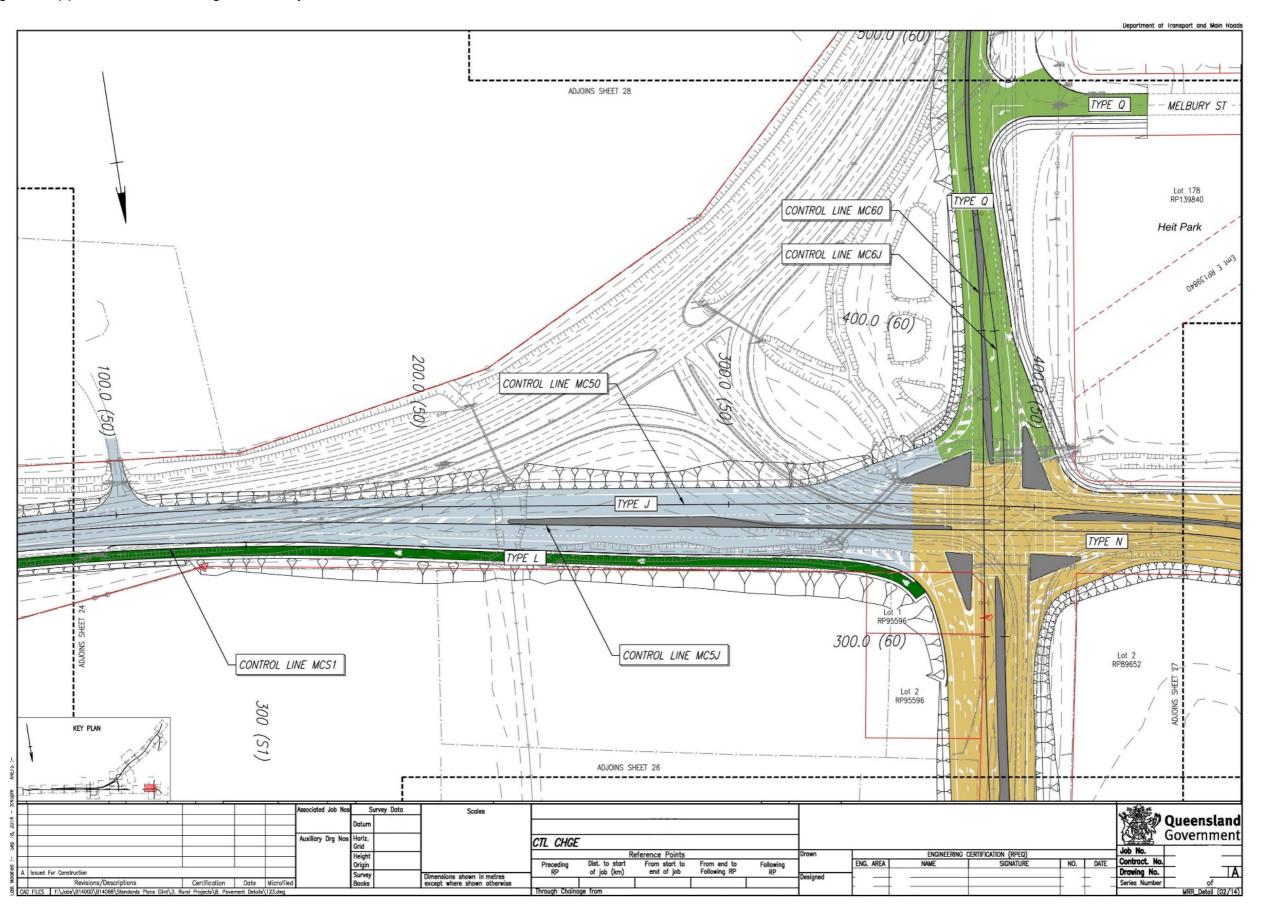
(f) – Pavement Subsoil Drainage Layout – generic example
